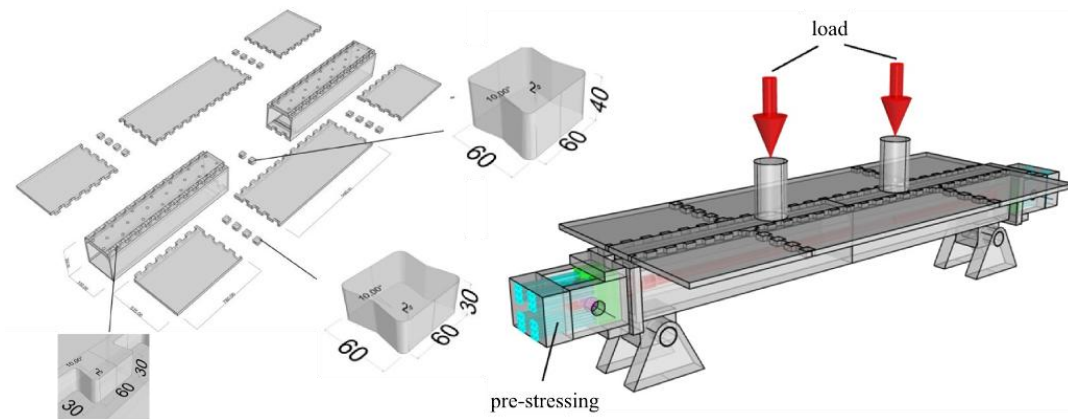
Shell, spatial and joint elements of the tested T-beam (left), jointed T-beam and testing setup (right)
